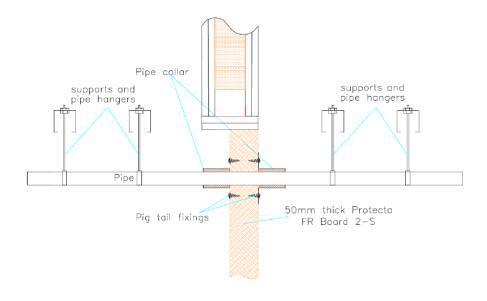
General arrangement of plastic pipes penetrating a minimum 50mm thick Protecta FR Board installed in drywalls and concrete/masonry walls and protected with Protecta FR Collar installed at both sides of the wall
